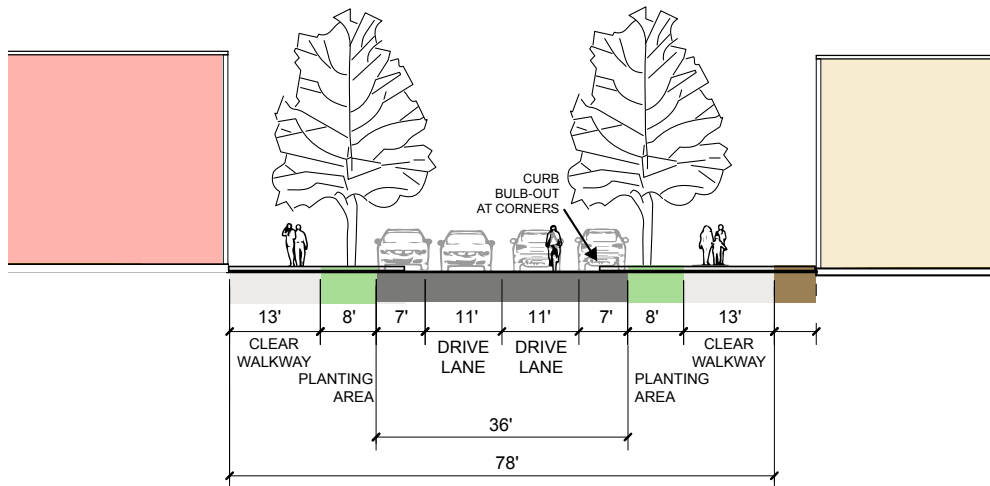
SIGNATURE STREET SECTION FOR 3RD AVENUE
